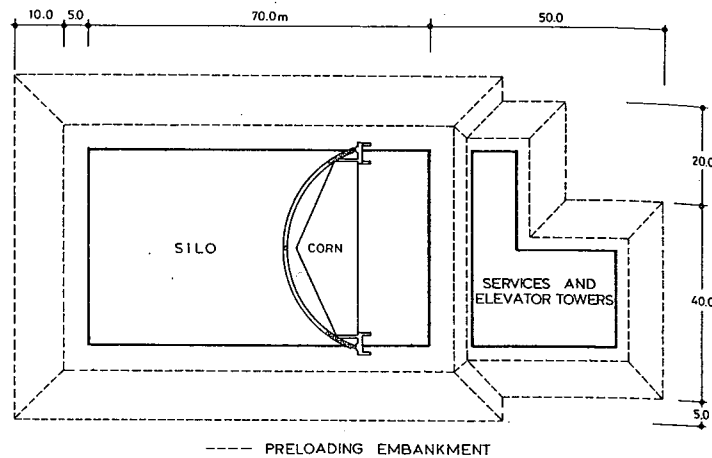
Site Plan with a Schematic Section of the Silo's Structure
